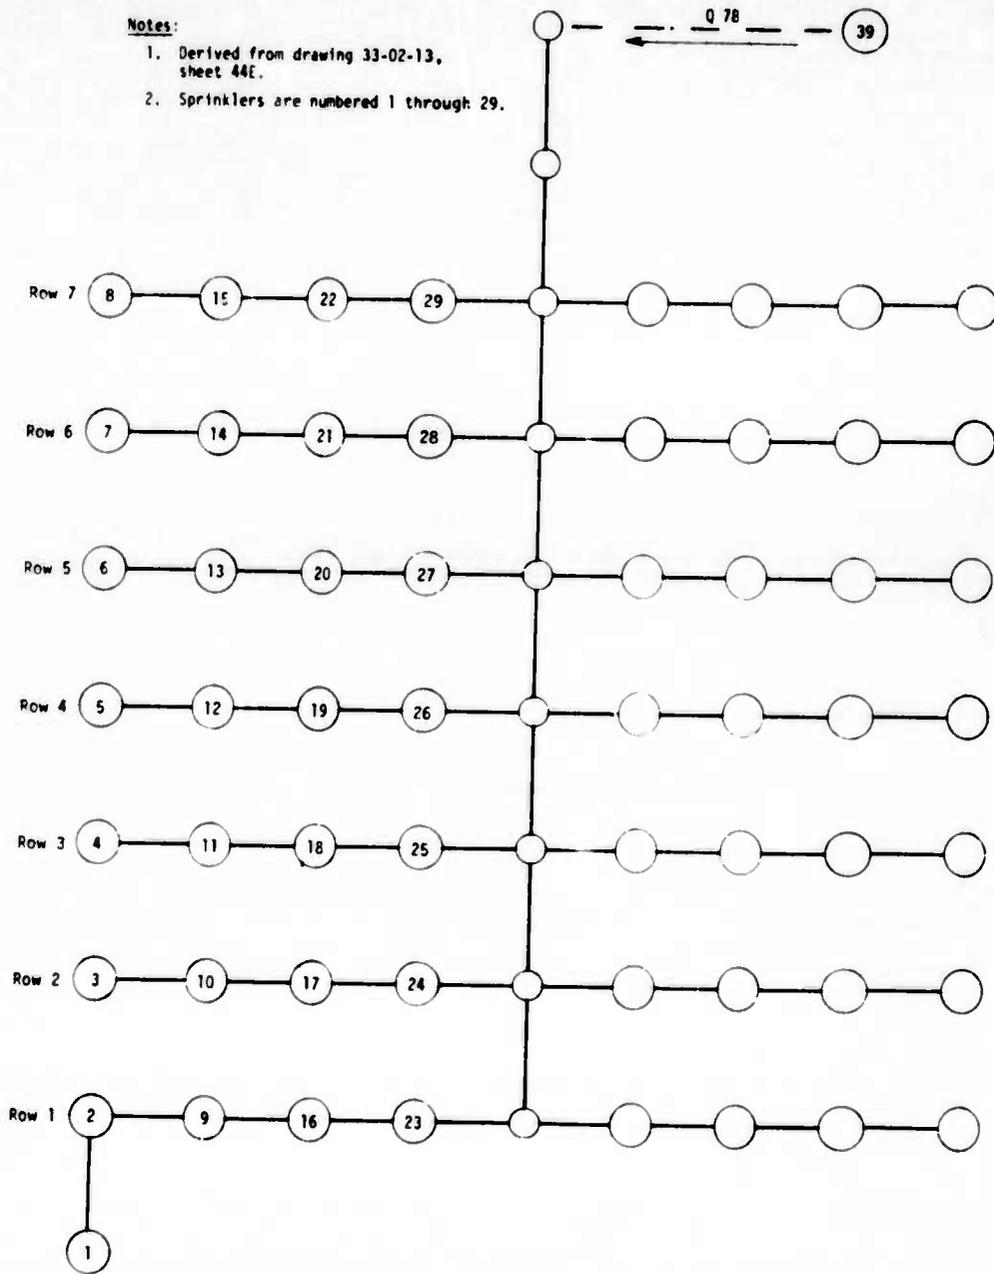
Large Sprinkler System in Buildings 350, 368, and 660 at Robins Air Force Base
